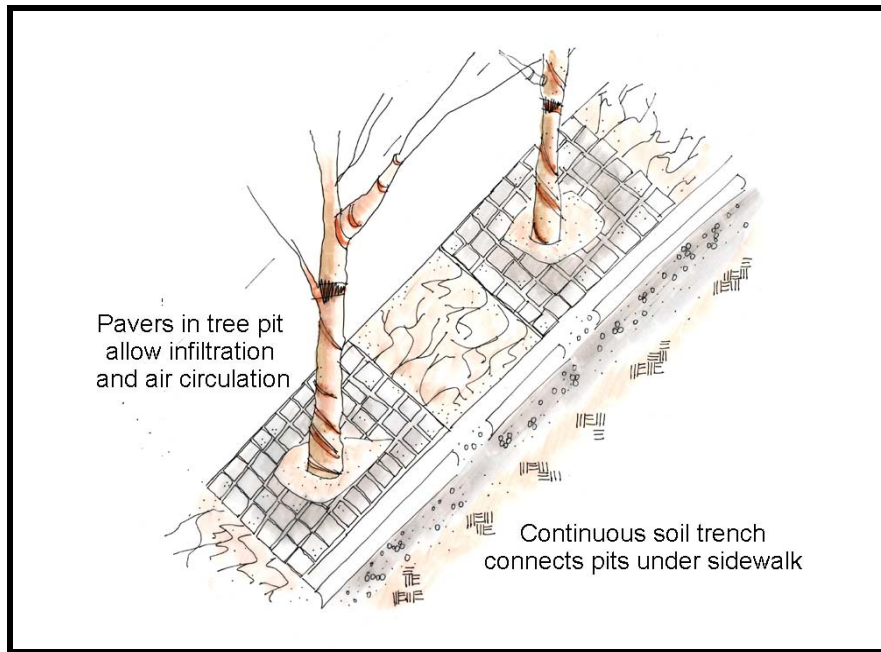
Structural soils used in a street tree application (Graphic by Matt Arnn)
